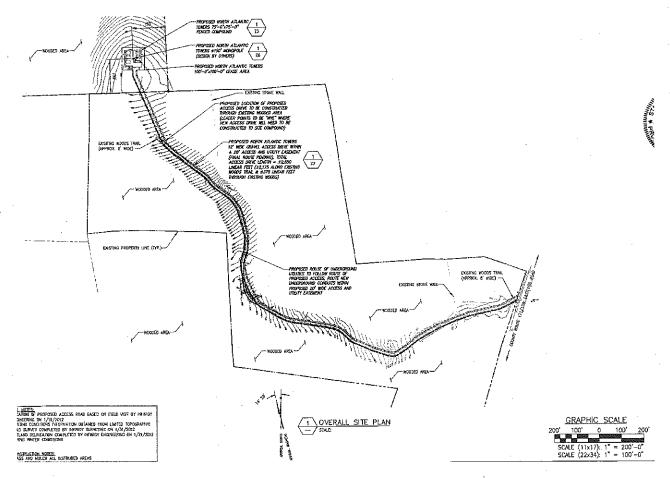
Site plan for proposed site and access road. (NAT/AT&T 10, Tab 6)
